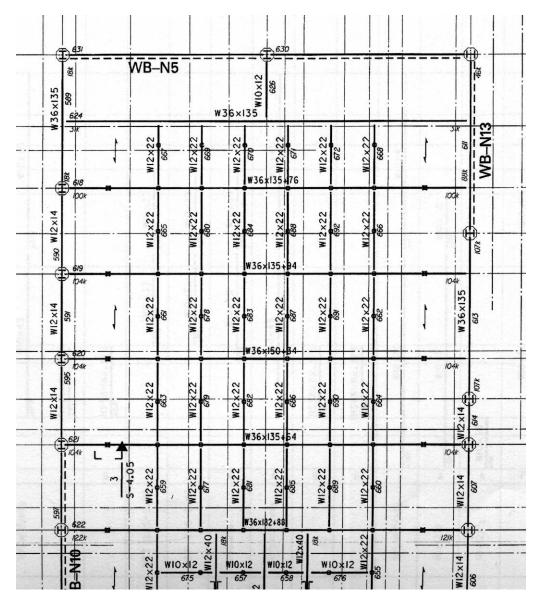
Structural Plan for Location 2 (center stage black box theatre) n.t.s.
